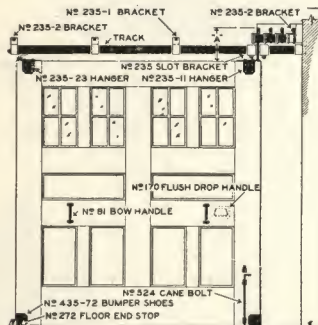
Interior elevation showing proper location and names of 235 Parts for Single Door Set AA-1, including one 524 Cane Bottom Bolt
